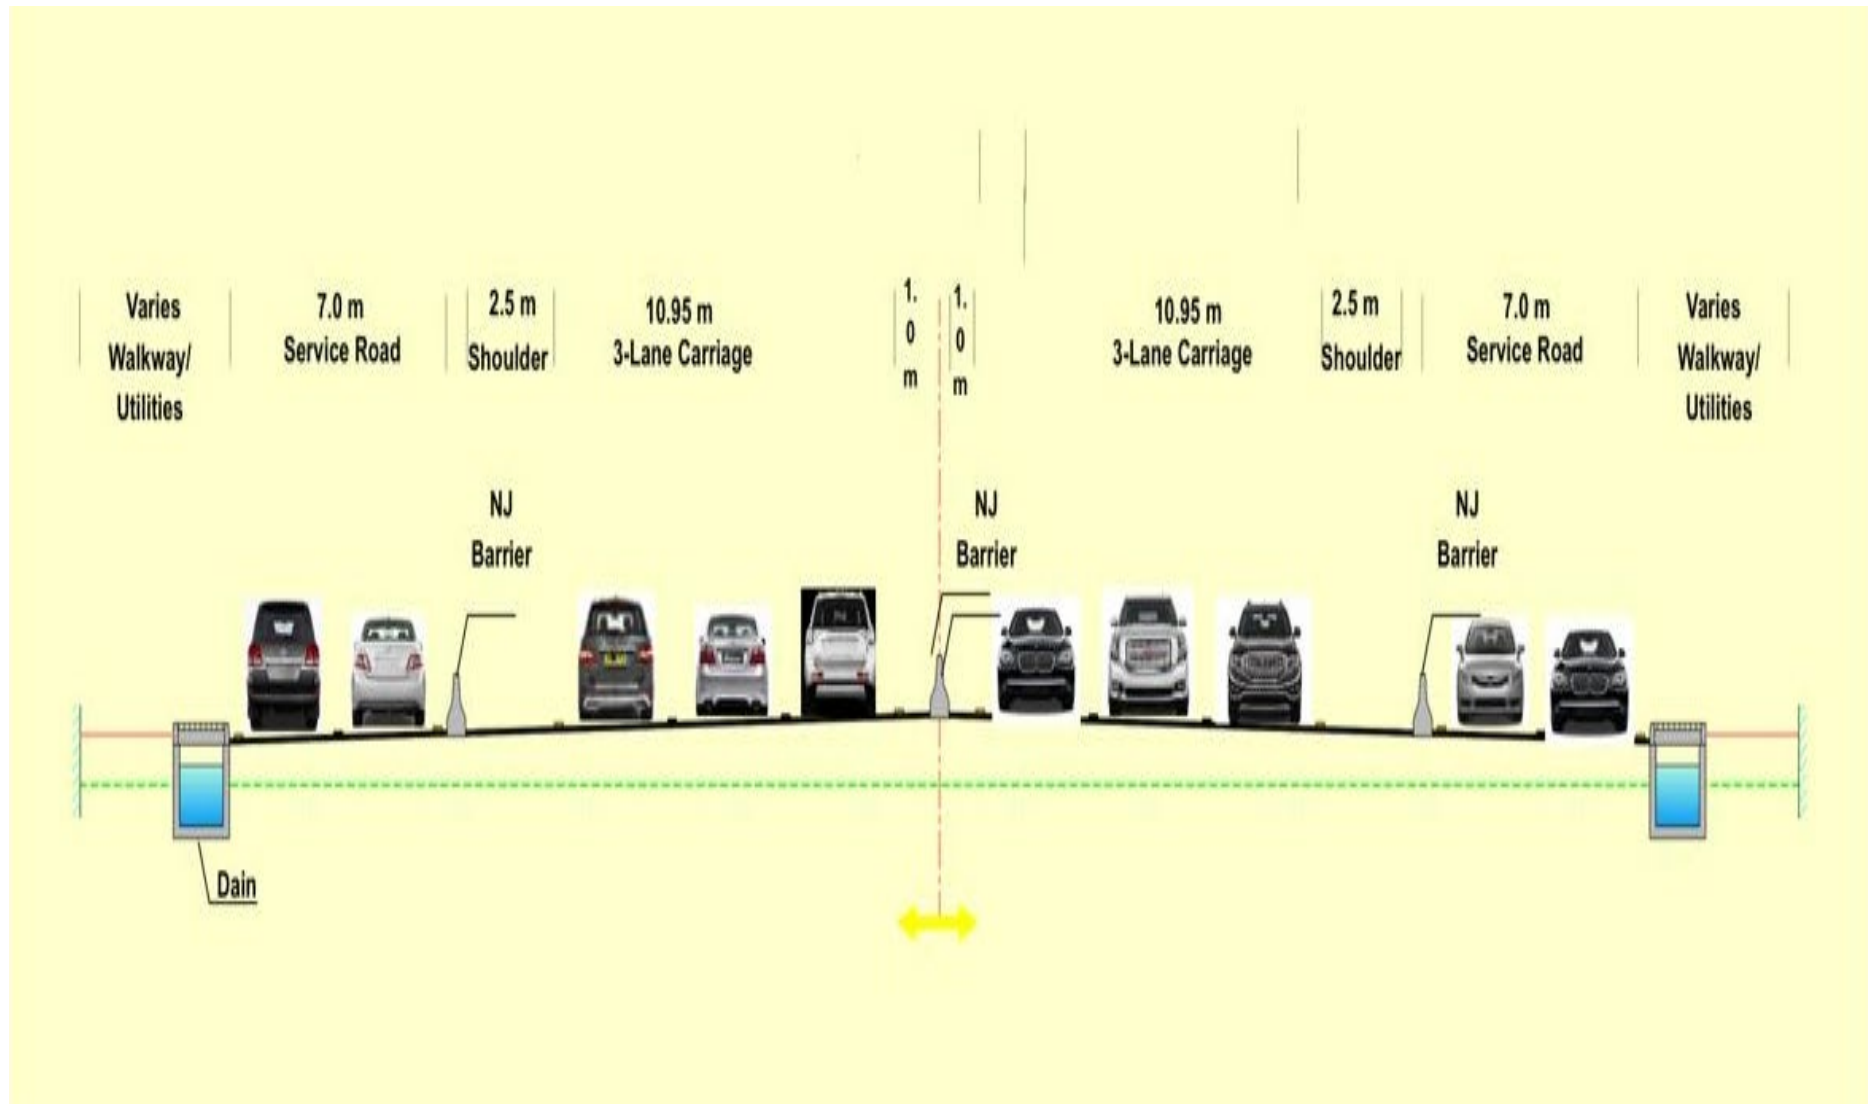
Typical Cross Section of the 3 Lane Road with Service Road
